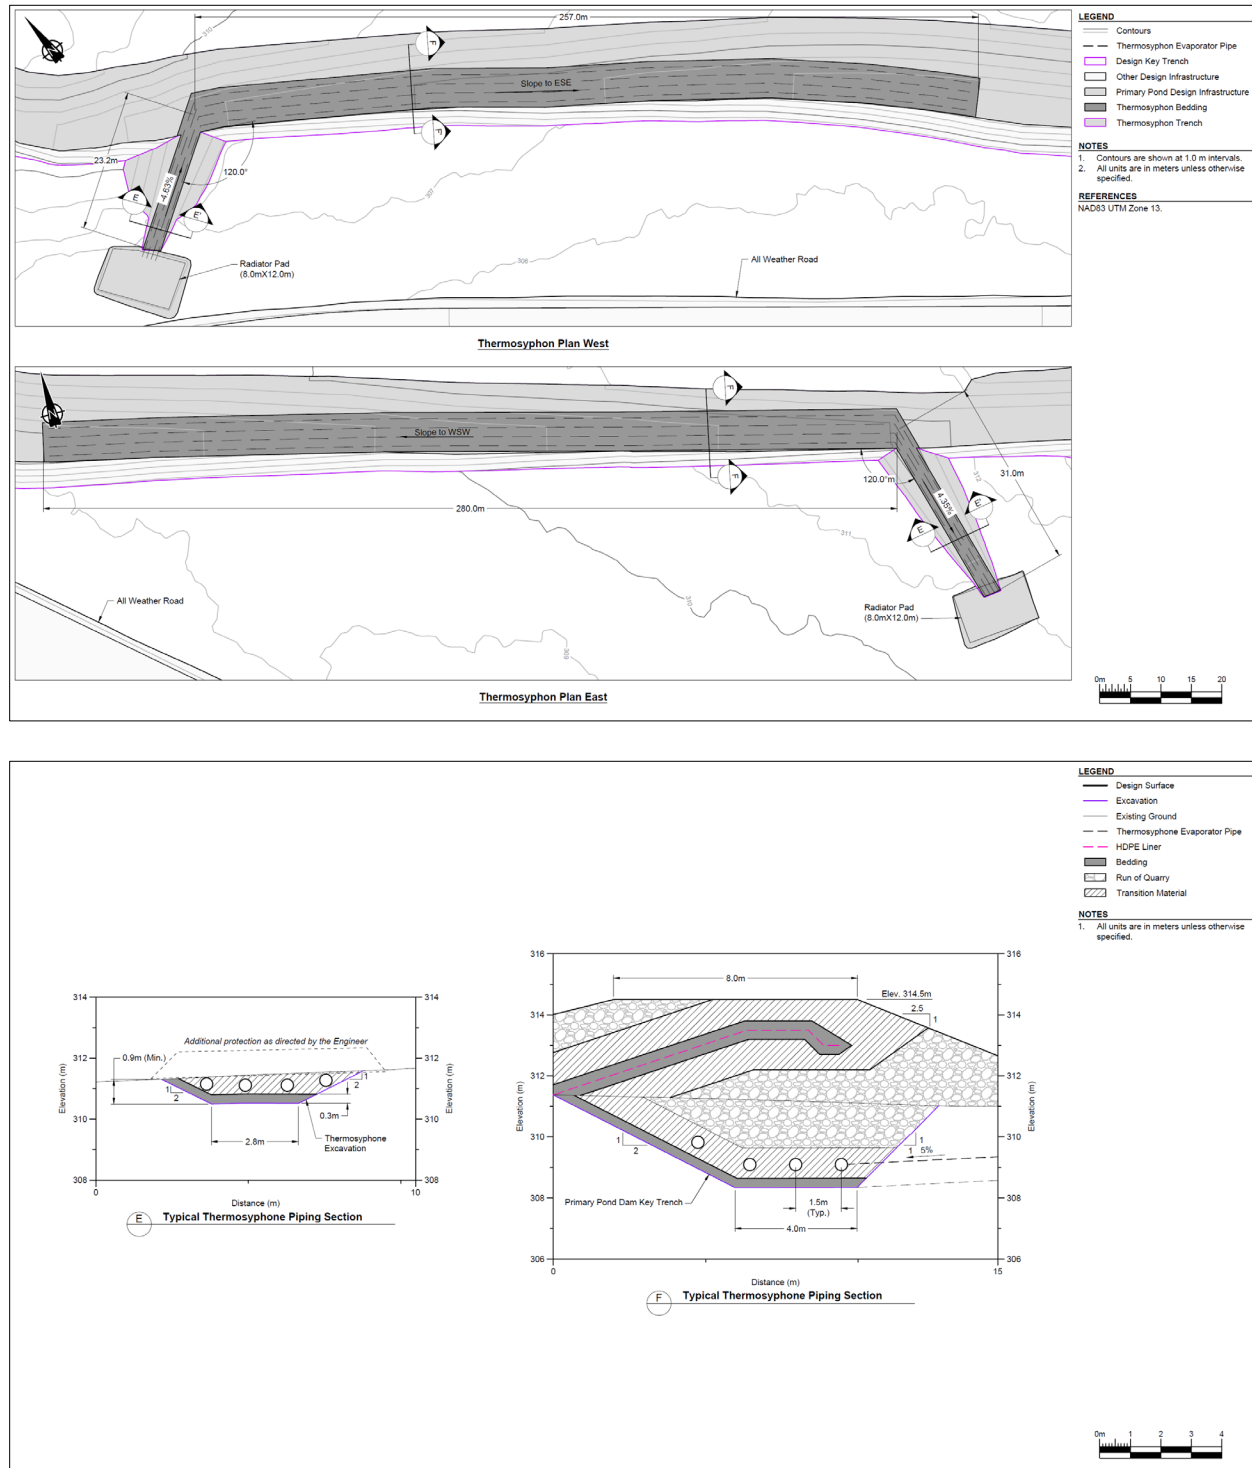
Example layout for thermosyphon evaporator pipes to be installed the key trench
